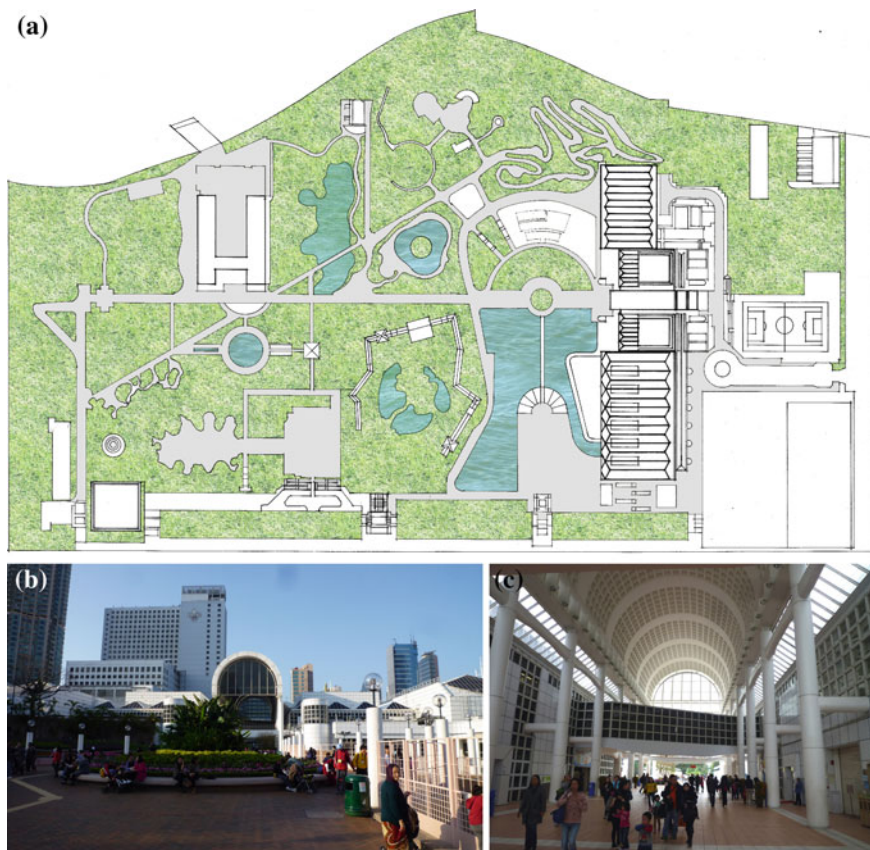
Kowloon Park, 1989. a Master plan. Courtesy of Dr. Simon Kwan. b Park building, mainly for sport and swimming. c Park building acting as a passenger route from Austin Road to the Kowloon Park
